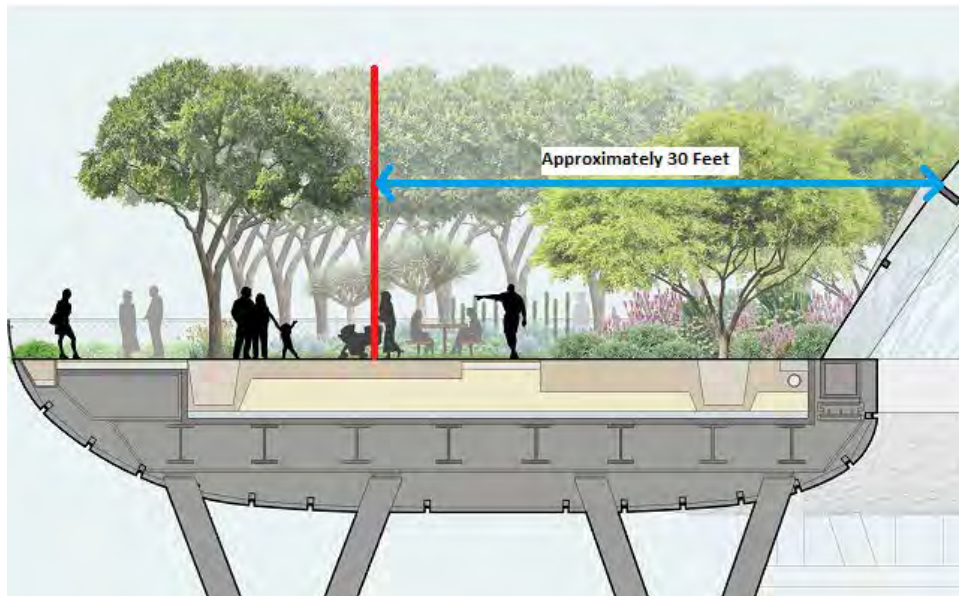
To the extent feasible, vegetation at the elevated park south of the site will be planted such that trees are set back from the glass façade, and dense shrubs and plants are located immediately adjacent to glass facades.
